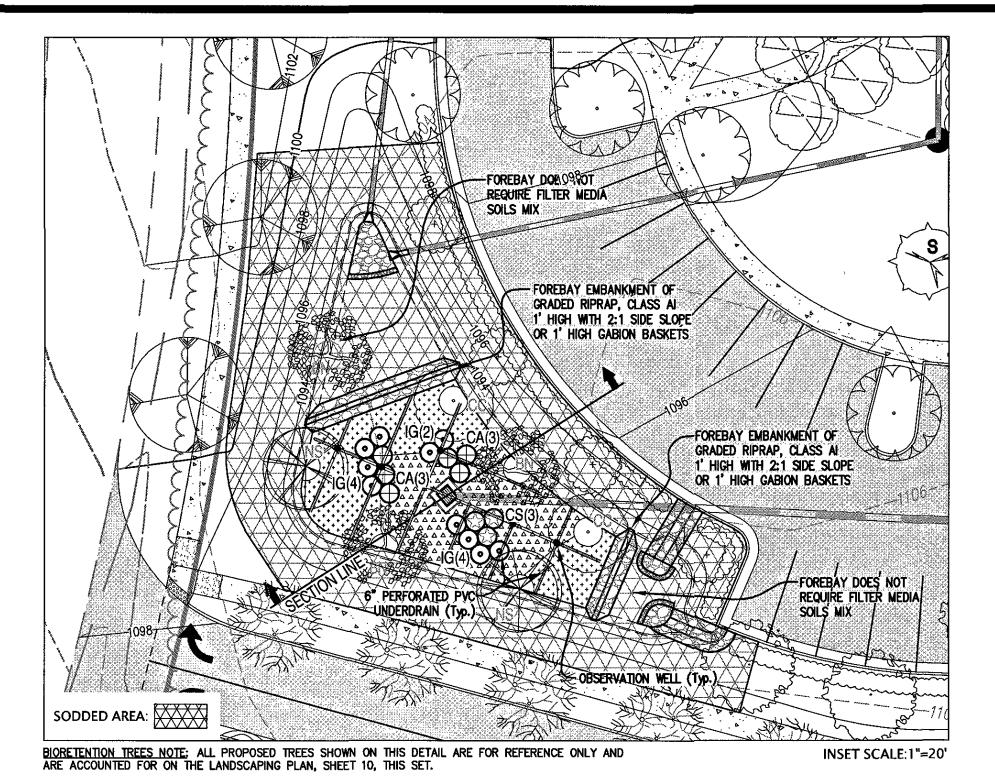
TYPICAL DETAIL OF BIORETENTION WITH PONDING
